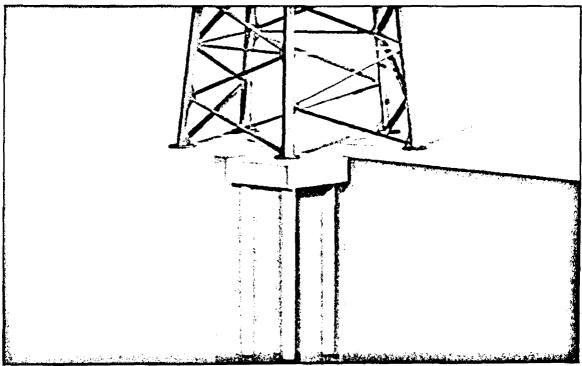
An expression of a pile foundation supporting a mast (littlerockfamilyhousing.com)
